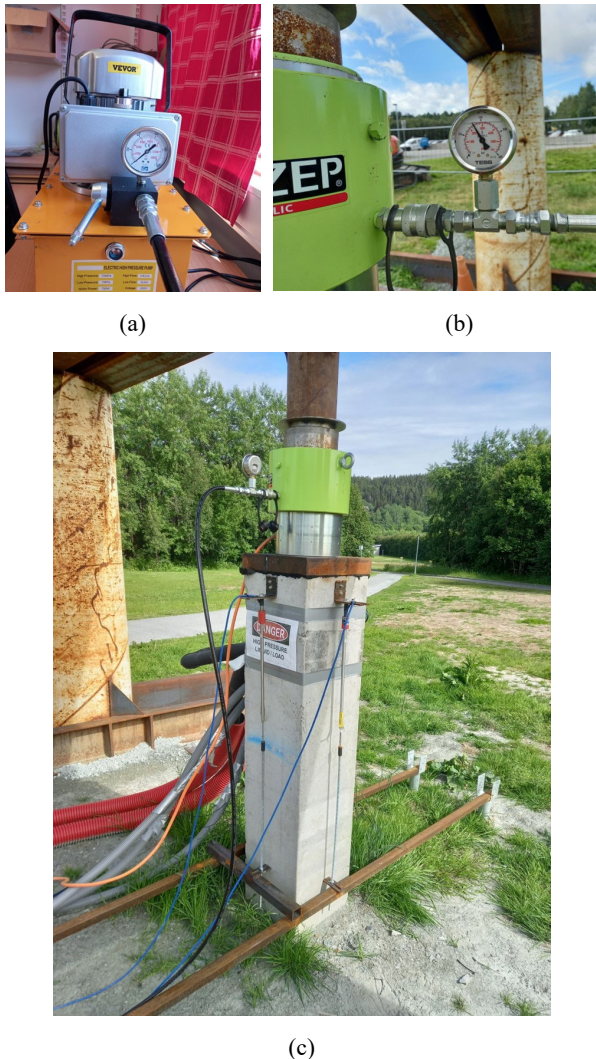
Loading arrangement for mechanical loading on EP1 (a) hydraulic pump, (b) hydraulic jack and gauge, (c) Reference beam and extensometers
